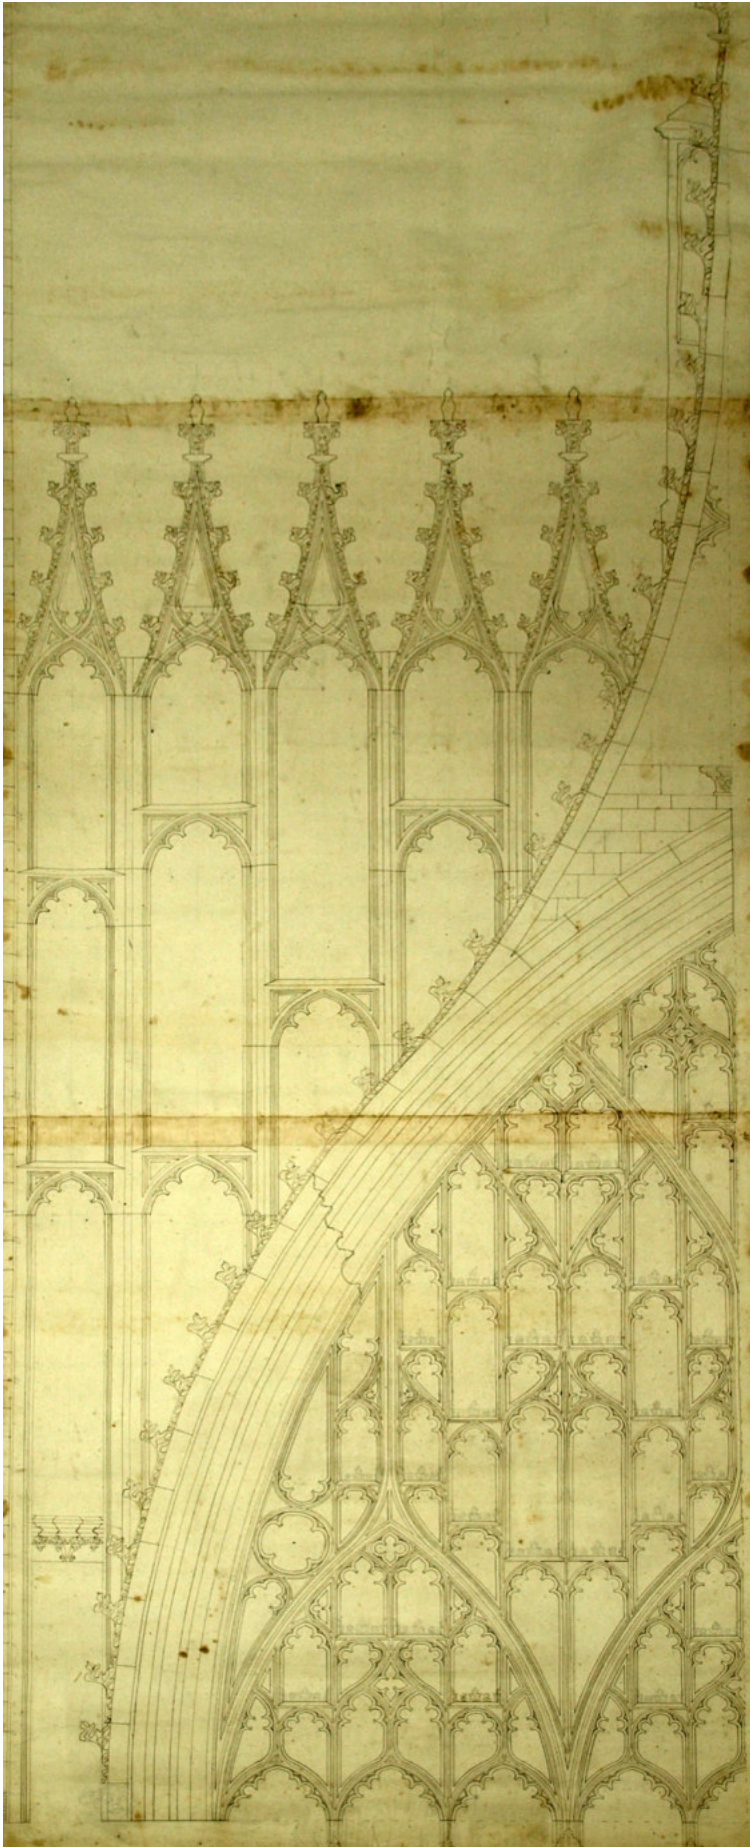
Part elevation of the Great East Window, 1830s-1840s (YML/3/17)
